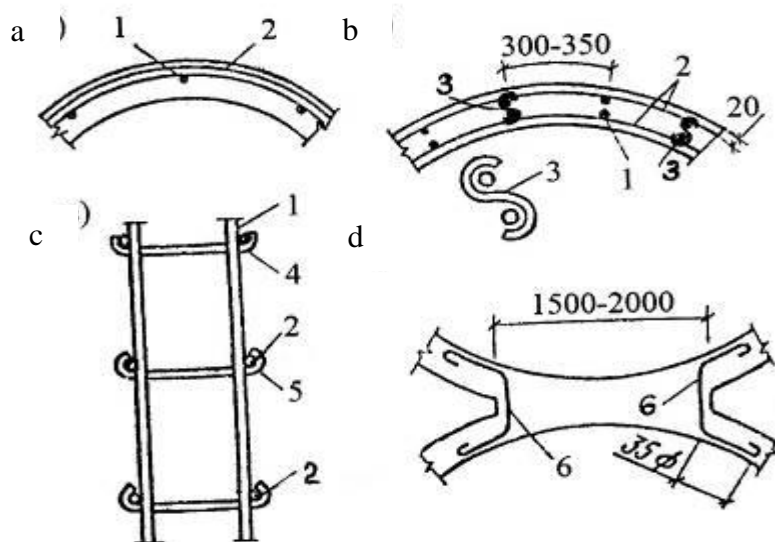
Details of reinforcement of walls of cylindrical monolithic silos:
